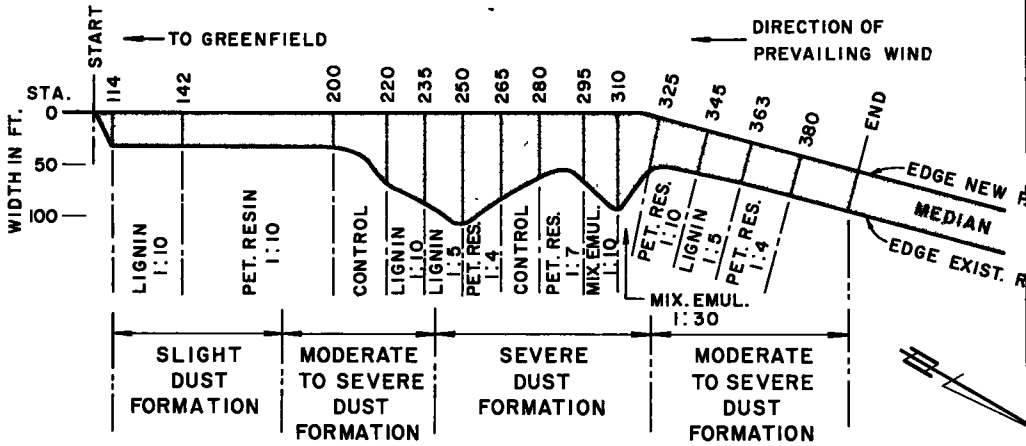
Dust control test sections—road V-Mon-2-D test sections laid on Aug. 12, and 14, 1957.
